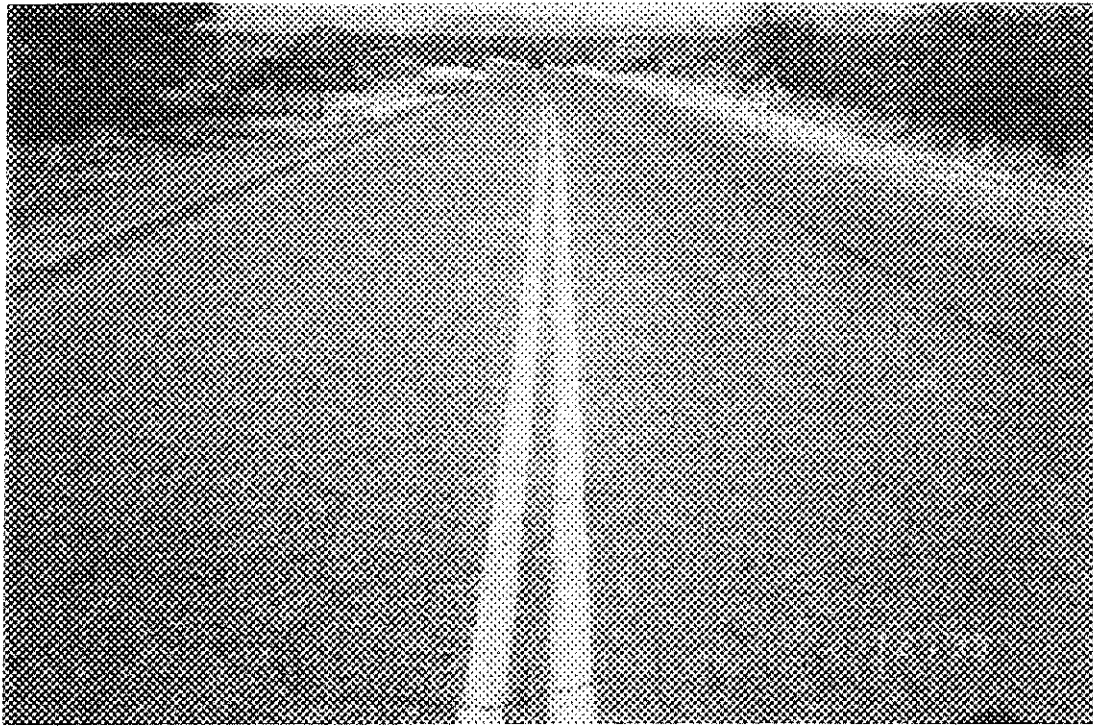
MP 0.00 - Begin route at Panther Junction, typical pavement section
